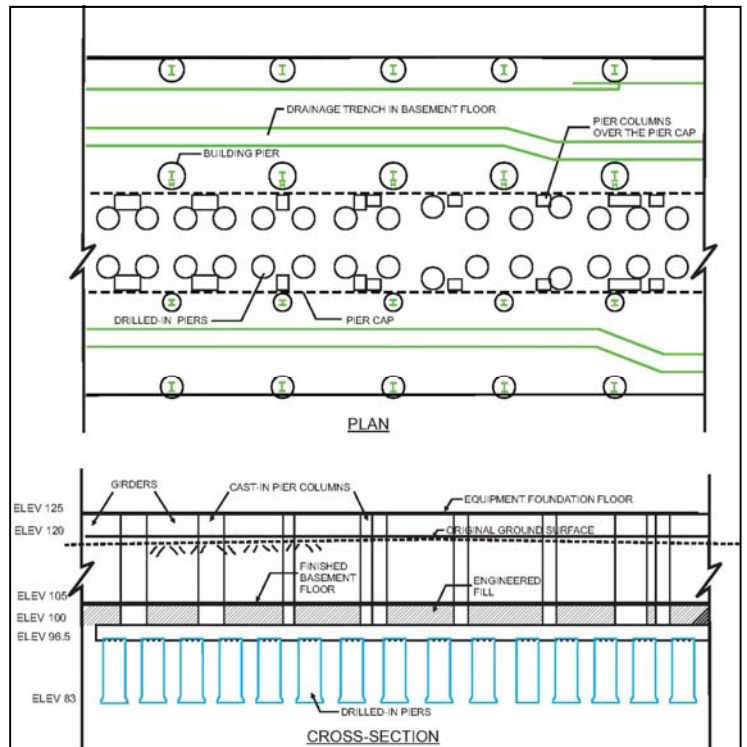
PLAN AND CROSS-SECTION OF THE FOUNDATION FOR THE ASSEMBLAGE TRACK IN THE MANUFACTURING PLANT
